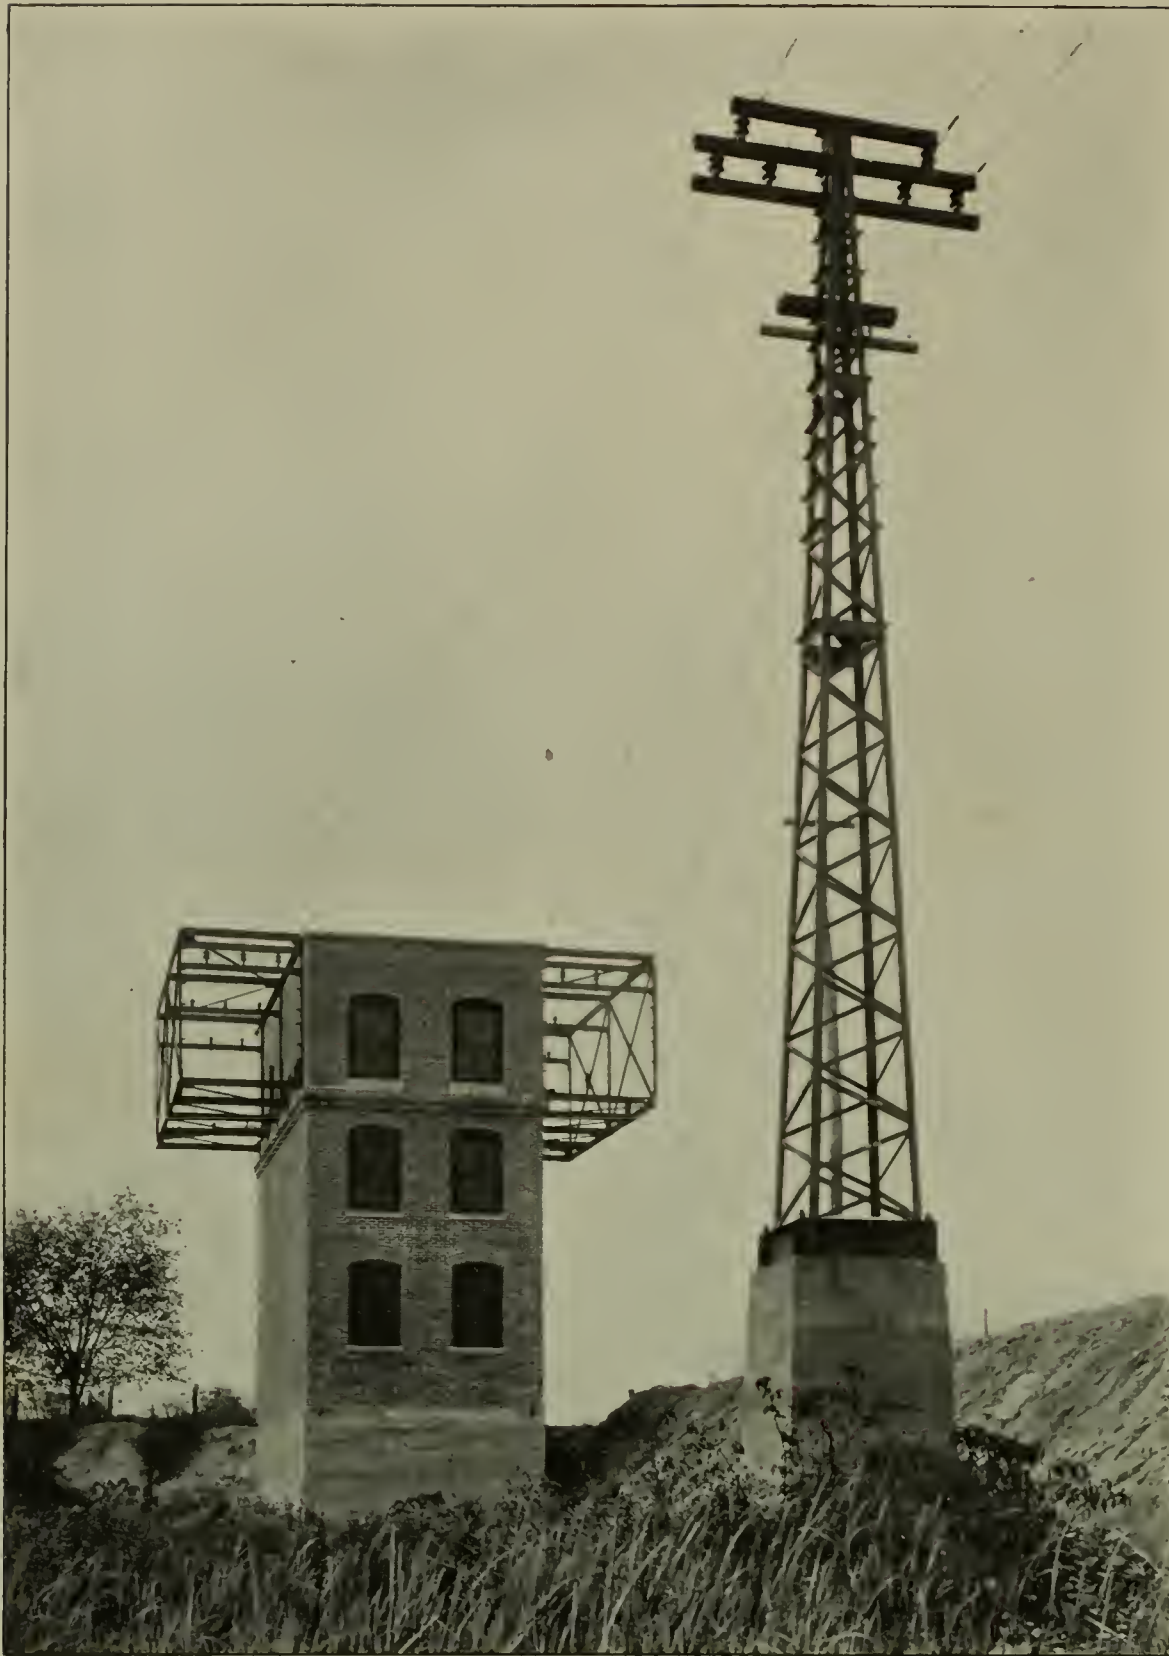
AN ARRESTER HOUSE AT DUNTON. WHENEVER THE UNDERGROUND CABLE IS JOINED TO THE OVERHEAD SYSTEM, LIGHTNING ARRESTERS AND CHOKE COILS ARE INSTALLED IN SUITABLE HOUSES
